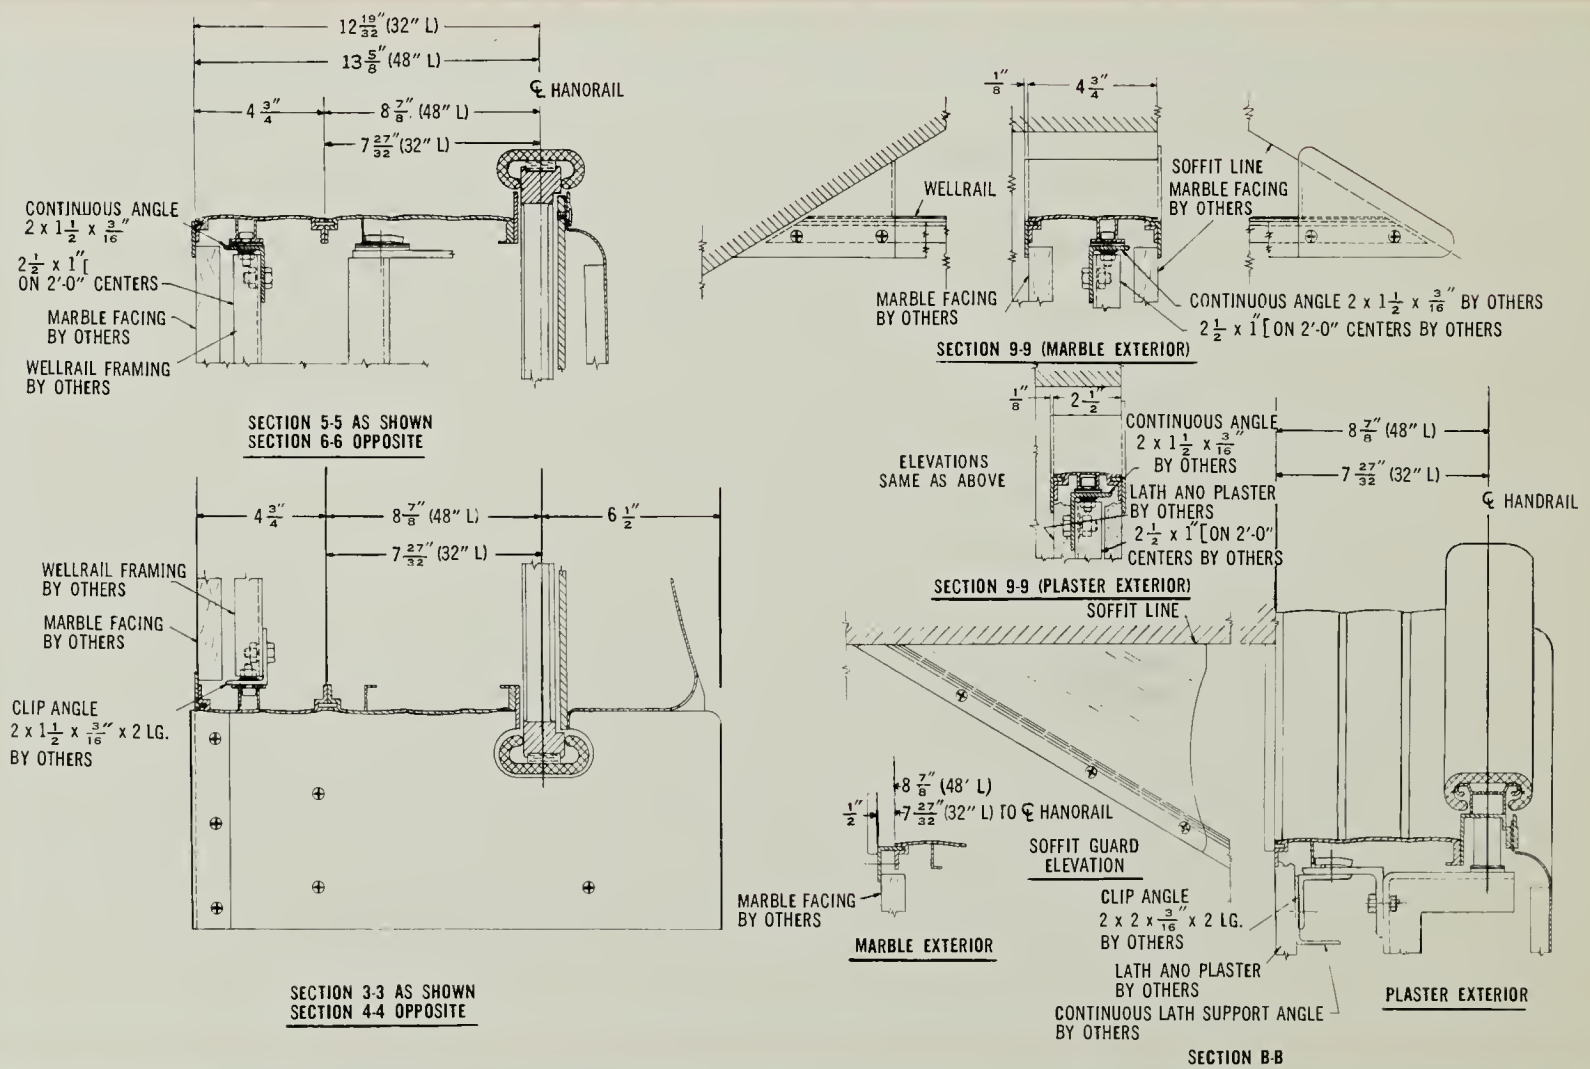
Wellway Railing Details-Plaster or Marble Exteriors
